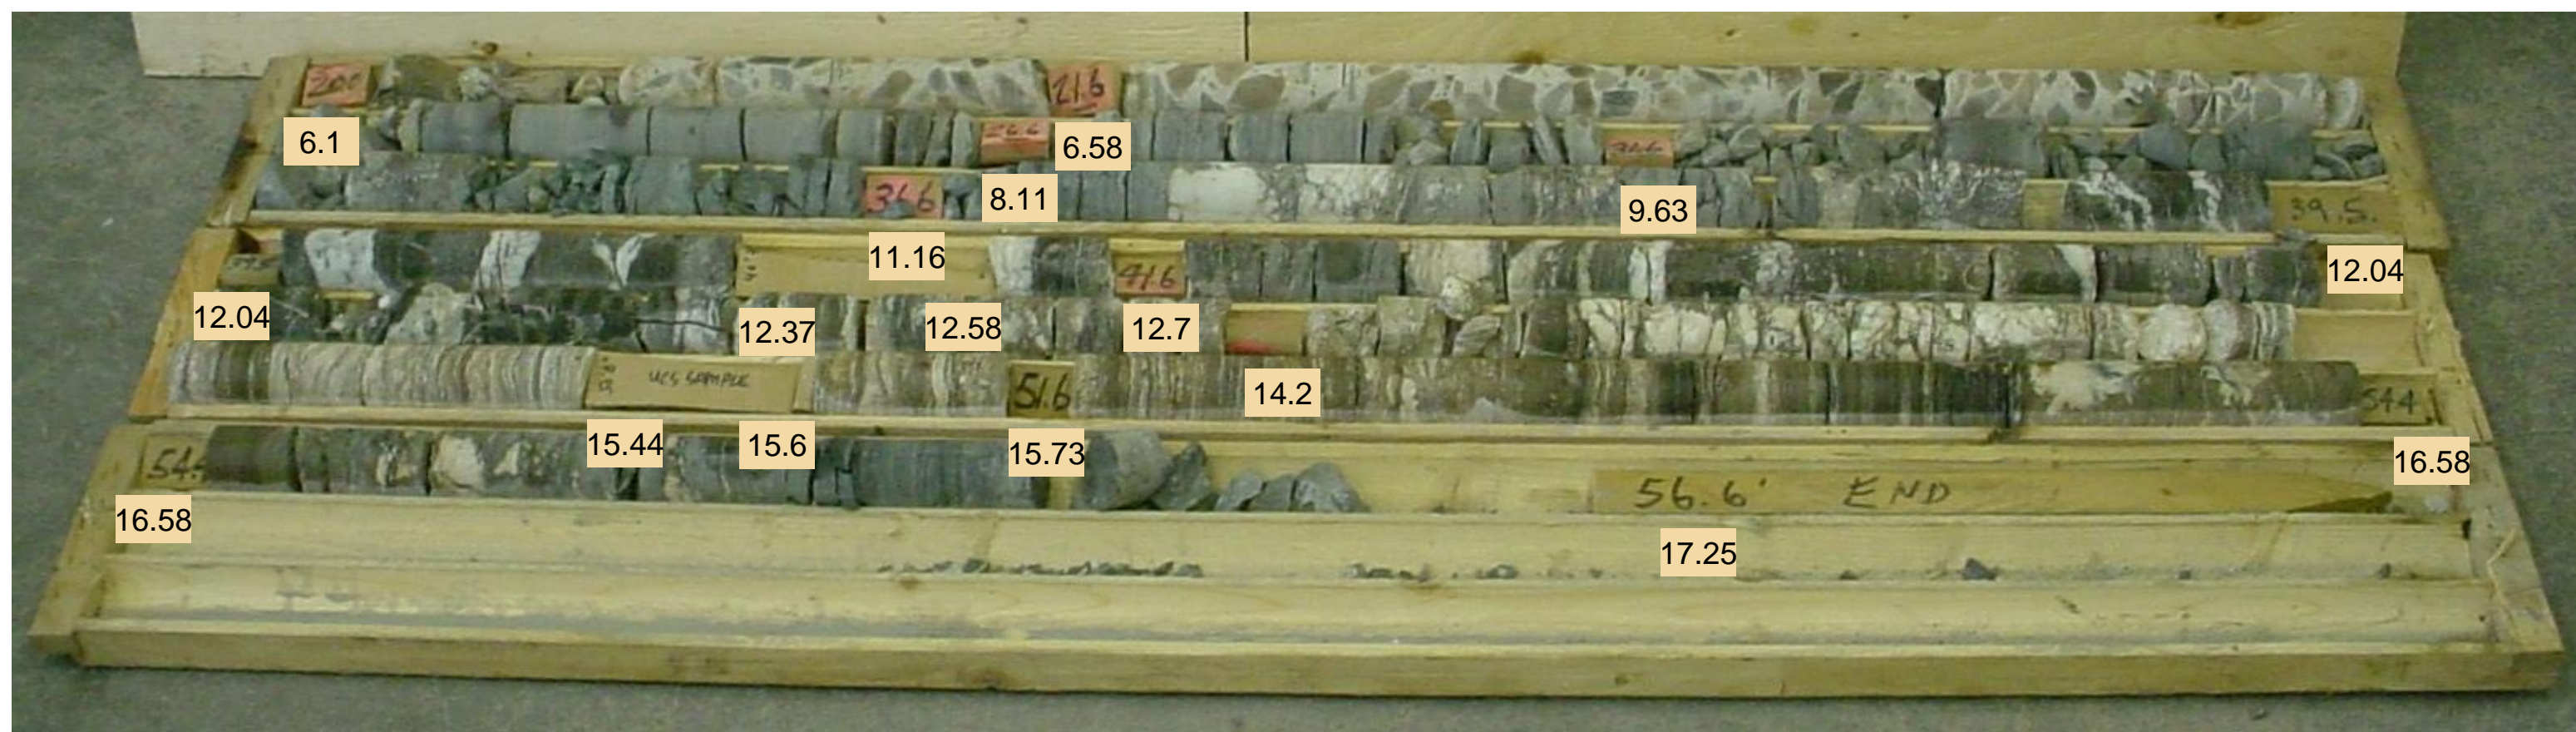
Borehole No. 106. Concrete to approximate elevation 186.0 metres. Elevation 185.38 metres to 174.23 metres.
